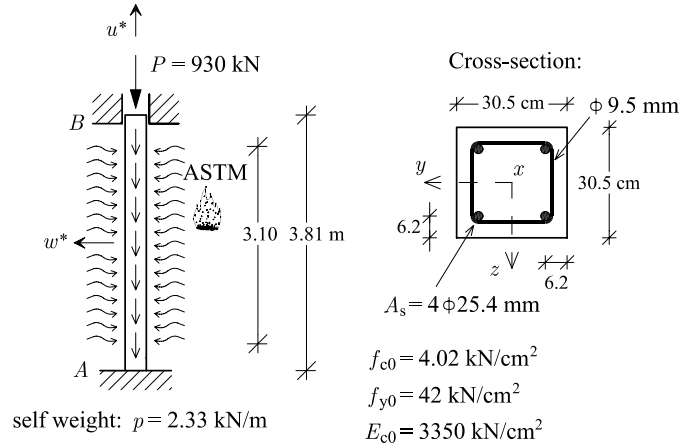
Clamped centrally loaded reinforced concrete column in fire [23].
